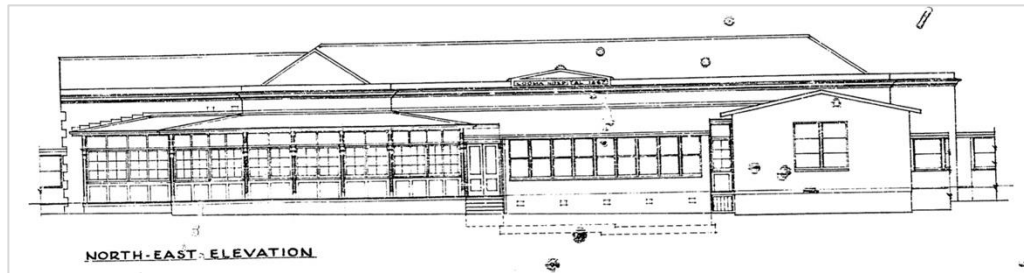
Detail from drawing for “remodelling of existing hospital building”, undated and unsigned, showing the enclosed north-east elevation of the building, with new ward on the right. (Source: NSW Plan Services (PWA), PH52-32 – Cooma Hospital – Existing Building Remodelling – Site & Floor Plan – Elevations & Sections)
